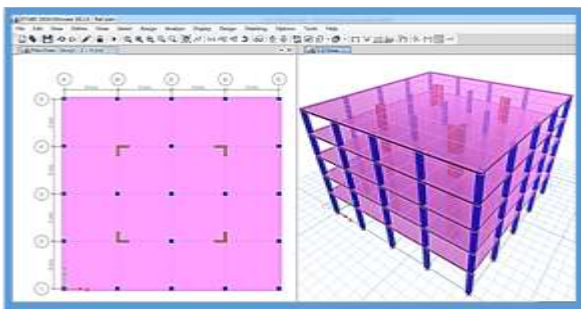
Flat slab with shear wall at interior corners (model 4)
